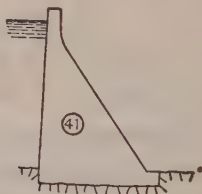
Curved Masonry Dams with Gravity Sections without Overflow
